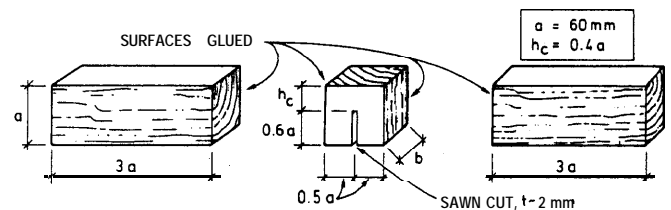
The test specimen is composed of three pieces of wood glued together to form a beam of cross section  $ab$  and length  $7a$ .
